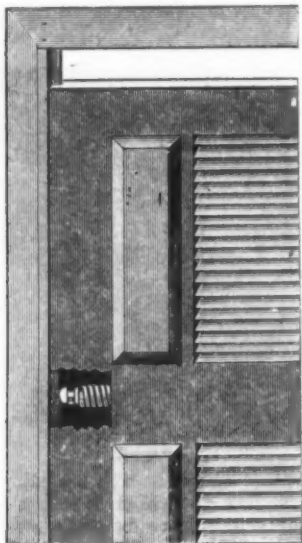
Sash Holder Applied to Sliding Blinds.
